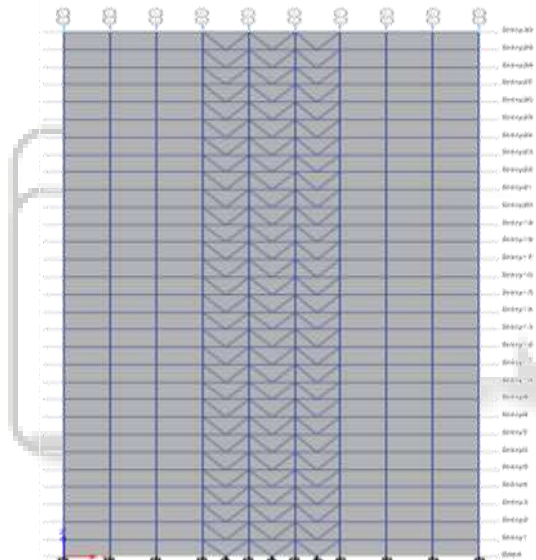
Elevation of 30 storey model HRB showing V-Bracing in three central bays at outer periphery.
